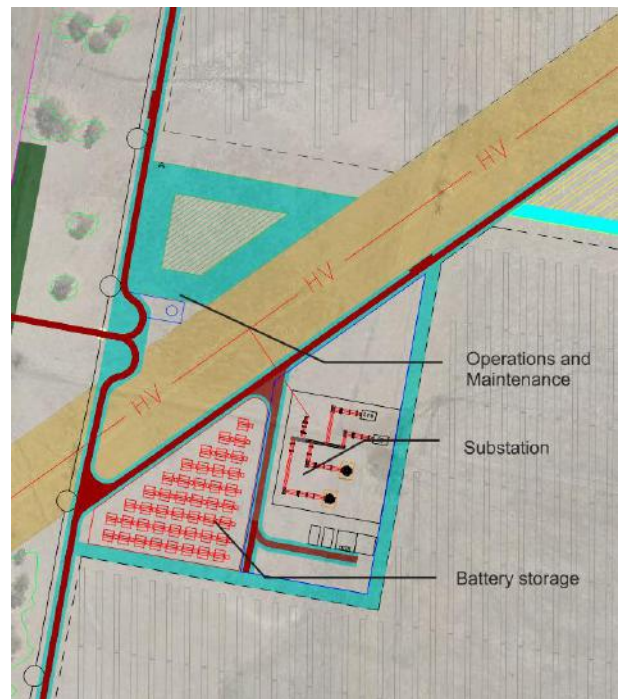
New Proposal: substation, battery storage, operational buildings. Source NG Electrical (Plans dated 29.05.2020) Modified to show ancillary area (Jacobs)
